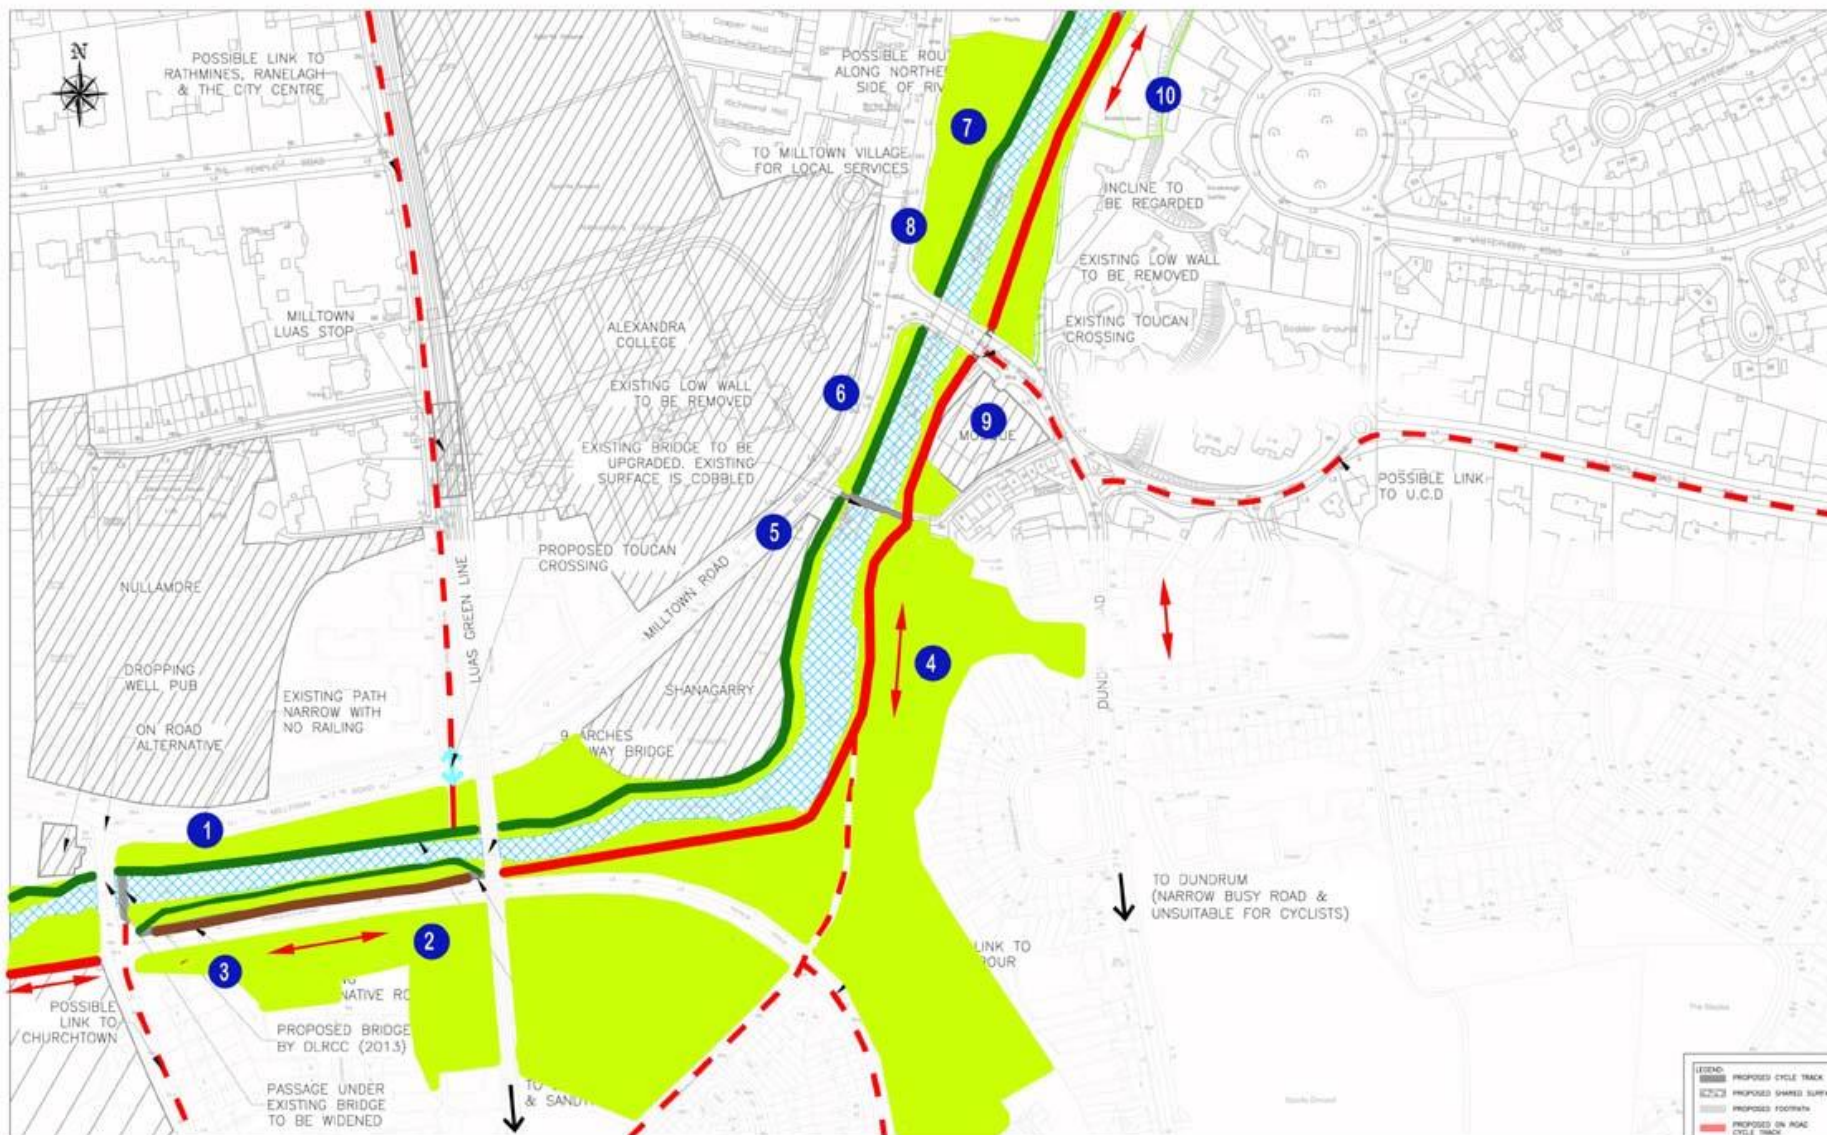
DCC/DLR: Proposed bridges above or below Dartry Park East weir should be omitted
